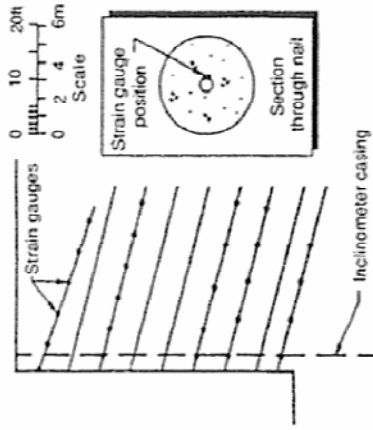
Design, construction and performance of a soil-nailed wall in Seattle, Washington—instrumented section.<sup>68</sup>
